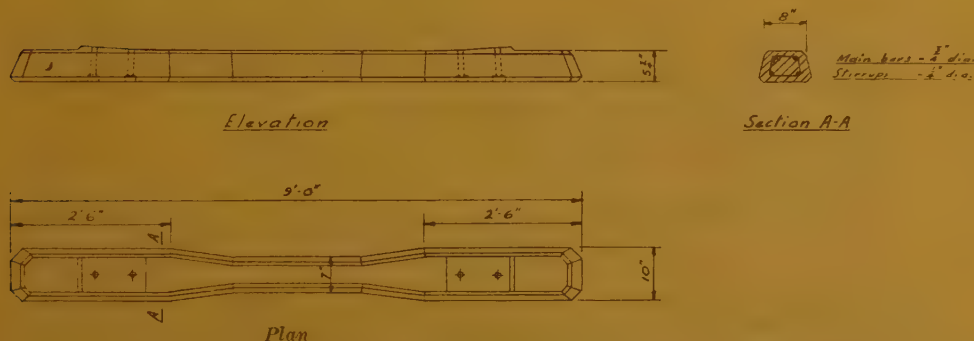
Reinforced concrete sleeper for use on main line track. Indian Government Railways.
